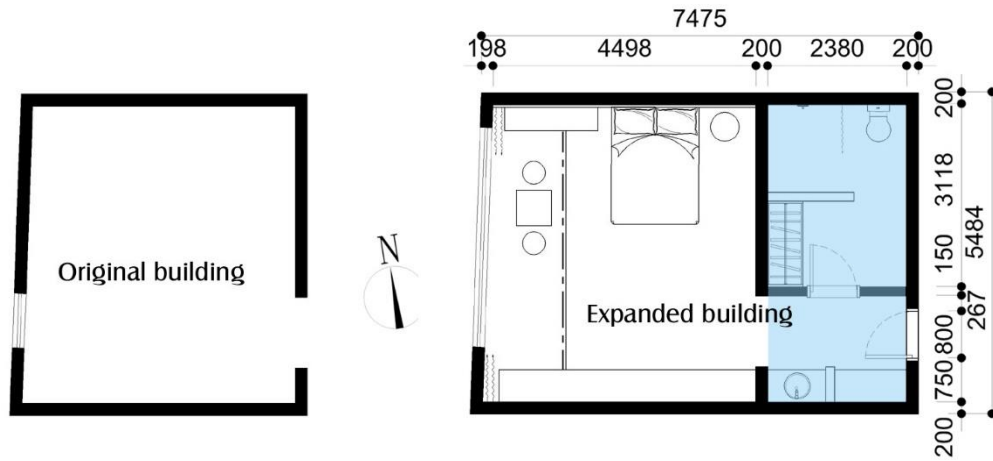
Senior Housing 1 Original and Expanded Floor Plan
